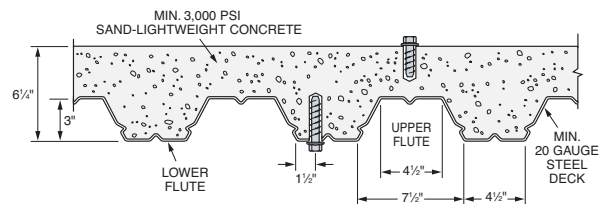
Figure A – Titen HD® screw anchor installed in the top and bottom of a structural sand-lightweight-concrete and metal-deck assembly
